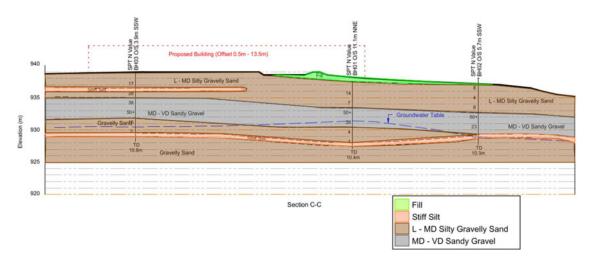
Geotechnical cross section, north-west to south-east (BCD GAR, 4th July 2023)
